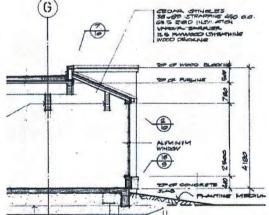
Original cedar shingle roof (from Howard Yano Architects).
